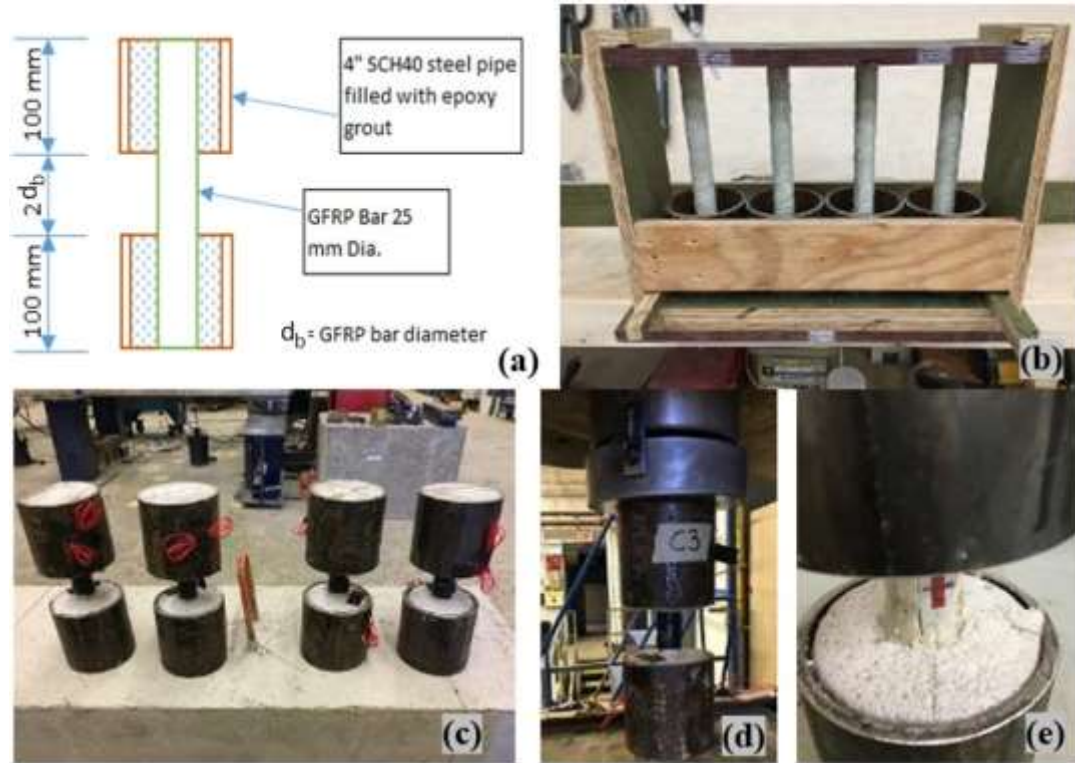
GFRP compression test set-up: (a) schematic (b) fabrication (c) all fabricated specimens (d) during testing (e) failure
